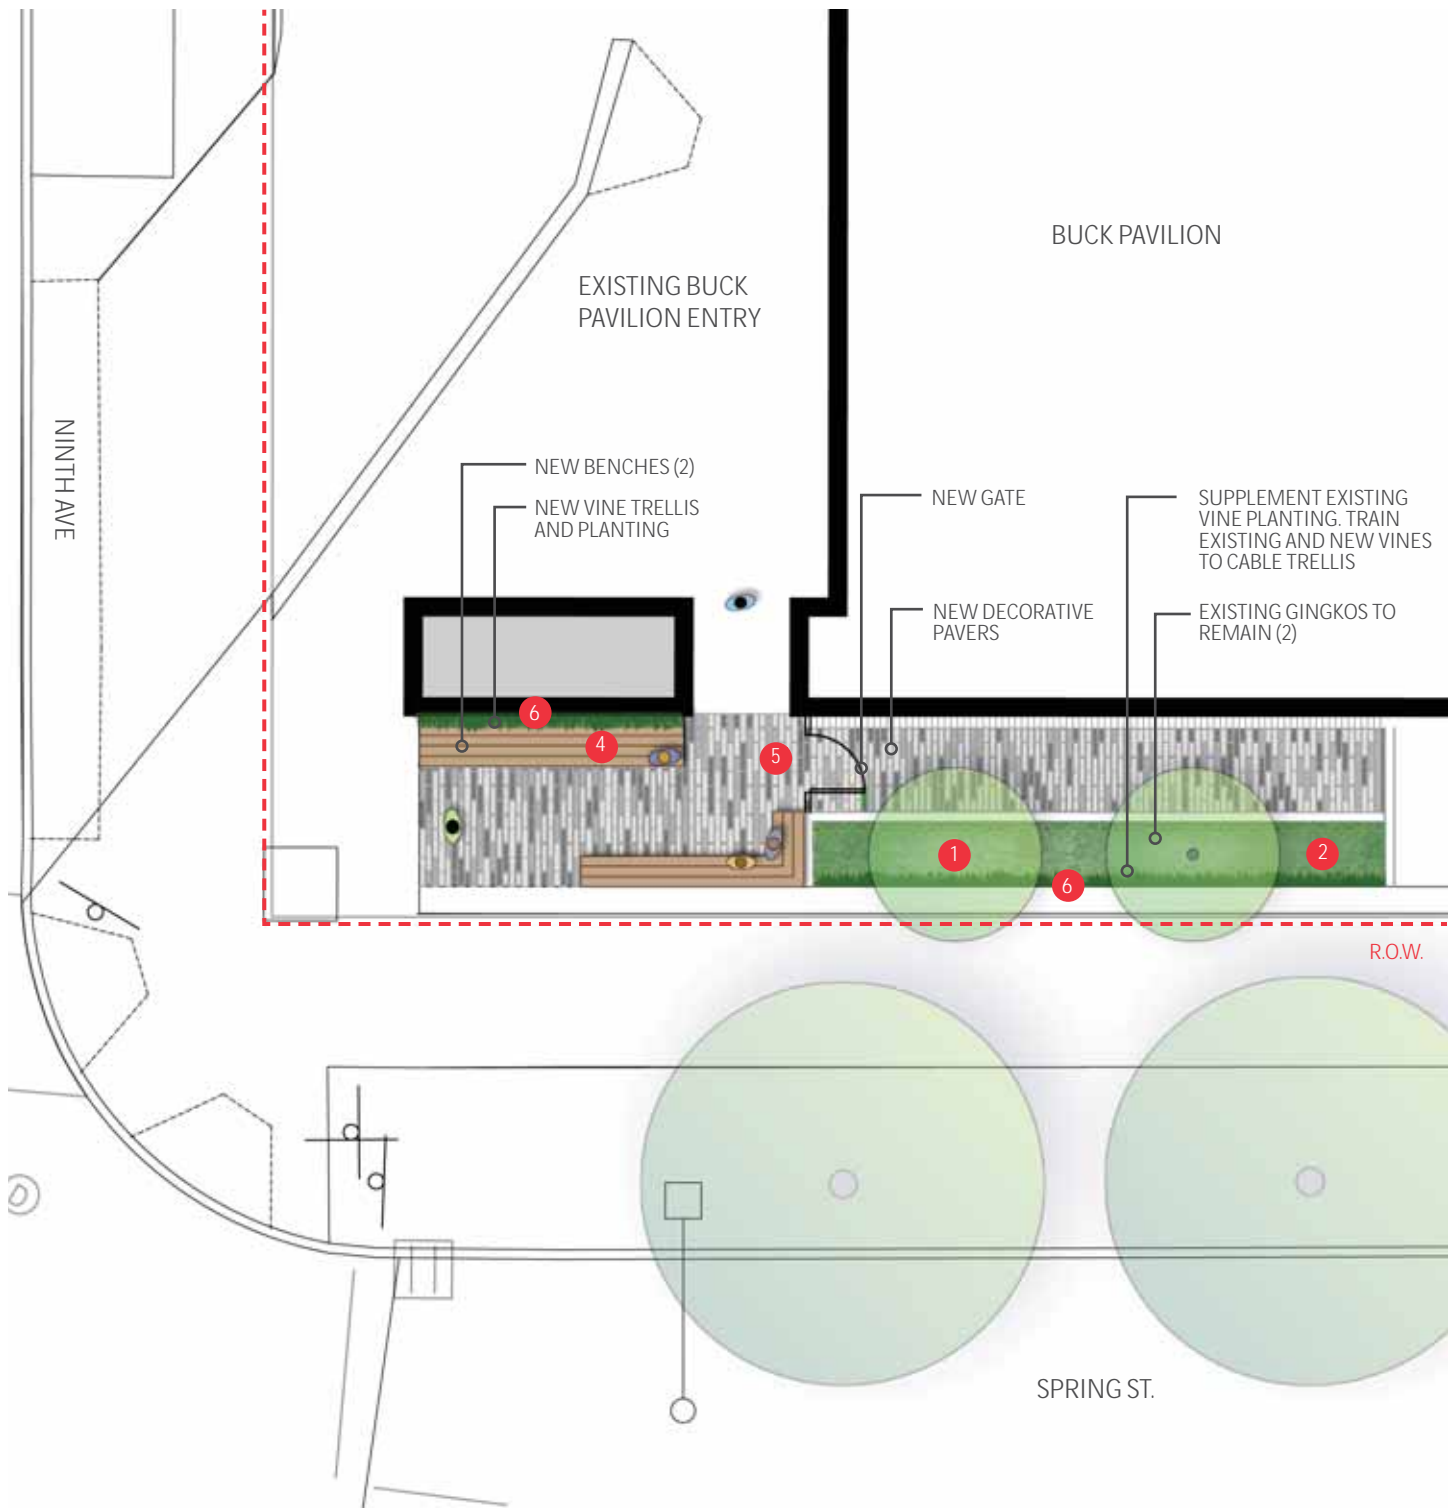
BUCK PAVILION ENTRY COURTYARD - PROPOSED PLAN
